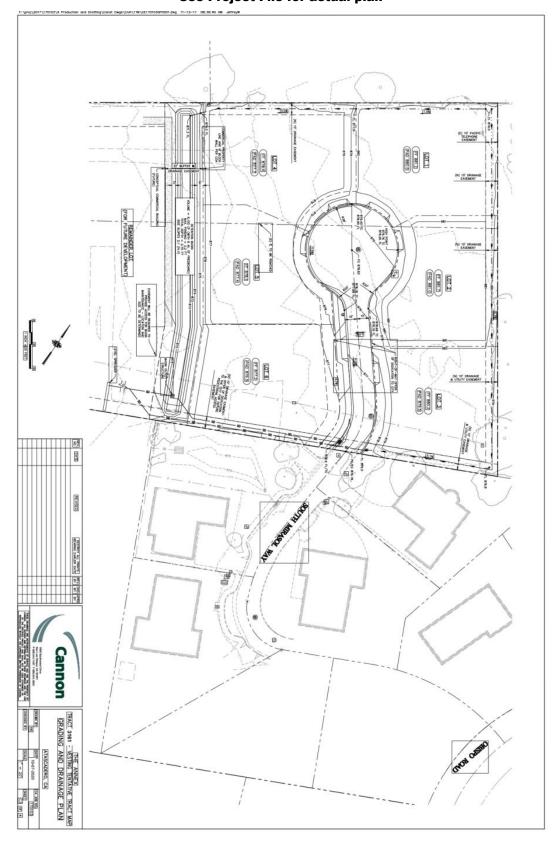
EXHIBIT H – GRADING AND DRAINAGE See Project File for actual plan
